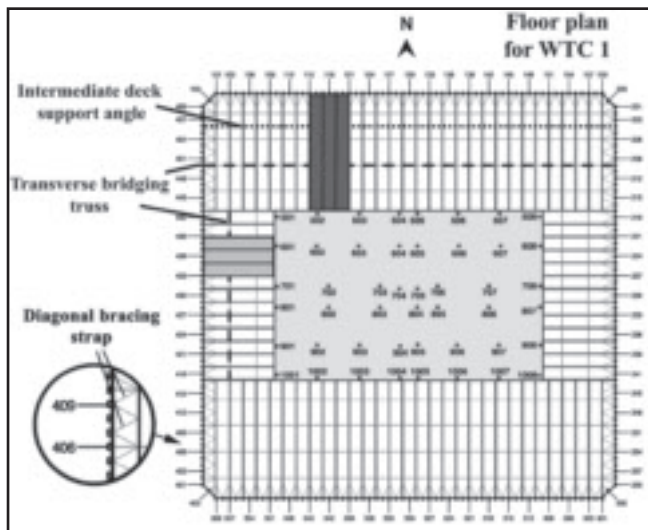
Typical floor plan showing three of the four major structural sub-systems: numbered exterior columns, numbered core columns, and the floor system. Both 35 ft (light shaded) and 60 ft (dark shaded) composite floor assemblies are highlighted. Examples of traverse bridging trusses and intermediate deck support angles are also indicated.
